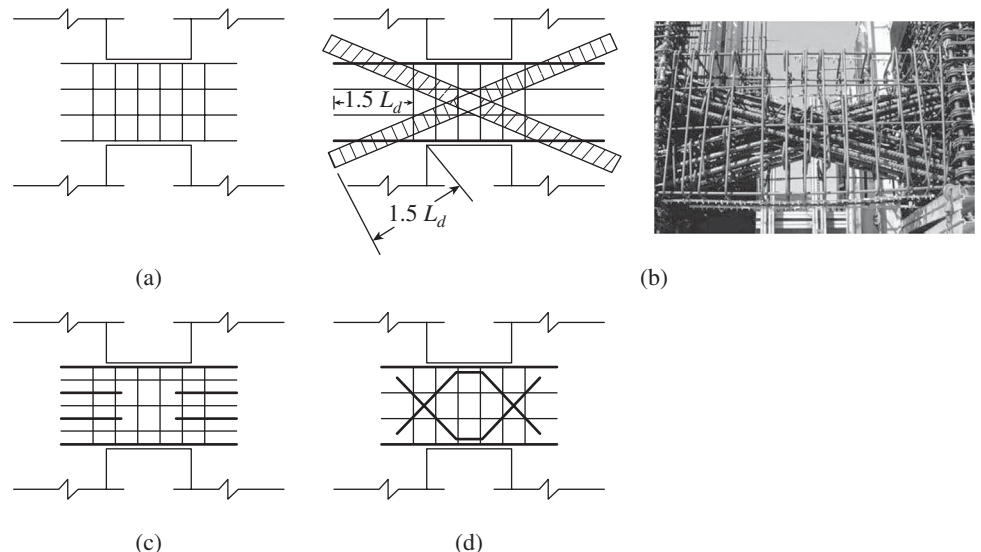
Reinforcement details in RC coupling beams (a) Conventional reinforcement (b) Diagonal reinforcement (c) Conventional reinforcement with dowels (d) Diagonal reinforcement at beam-wall interface
